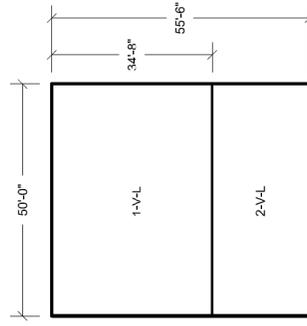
H.6-121: COOLING TOWER INTERNAL WALLS, LOOKING WEST
